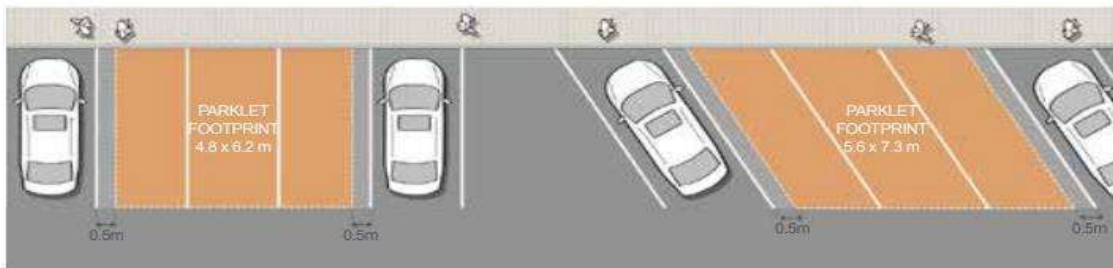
Example of Parklet Design Within Existing Angled and Perpendicular Parking Space (Placeholder image)
